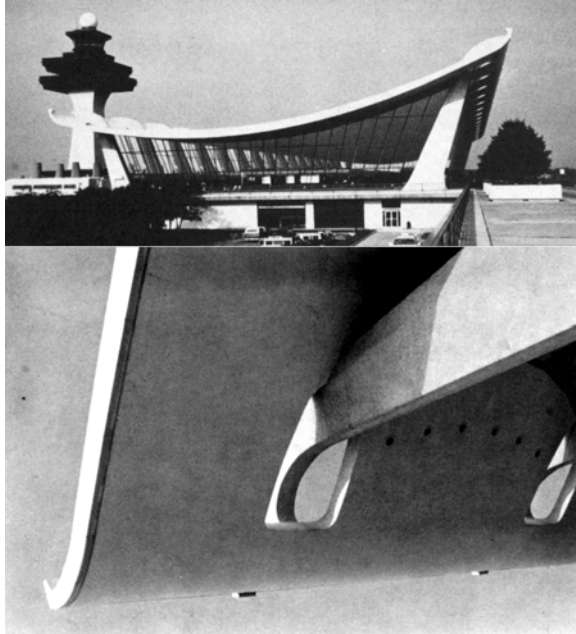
General view and detail of cable suspended concrete roof of Dulles International Airport, Washington, D.C., Eero Saarinen, architect, Boyd G. Anderson, engineer. 1965. (Zannos)
